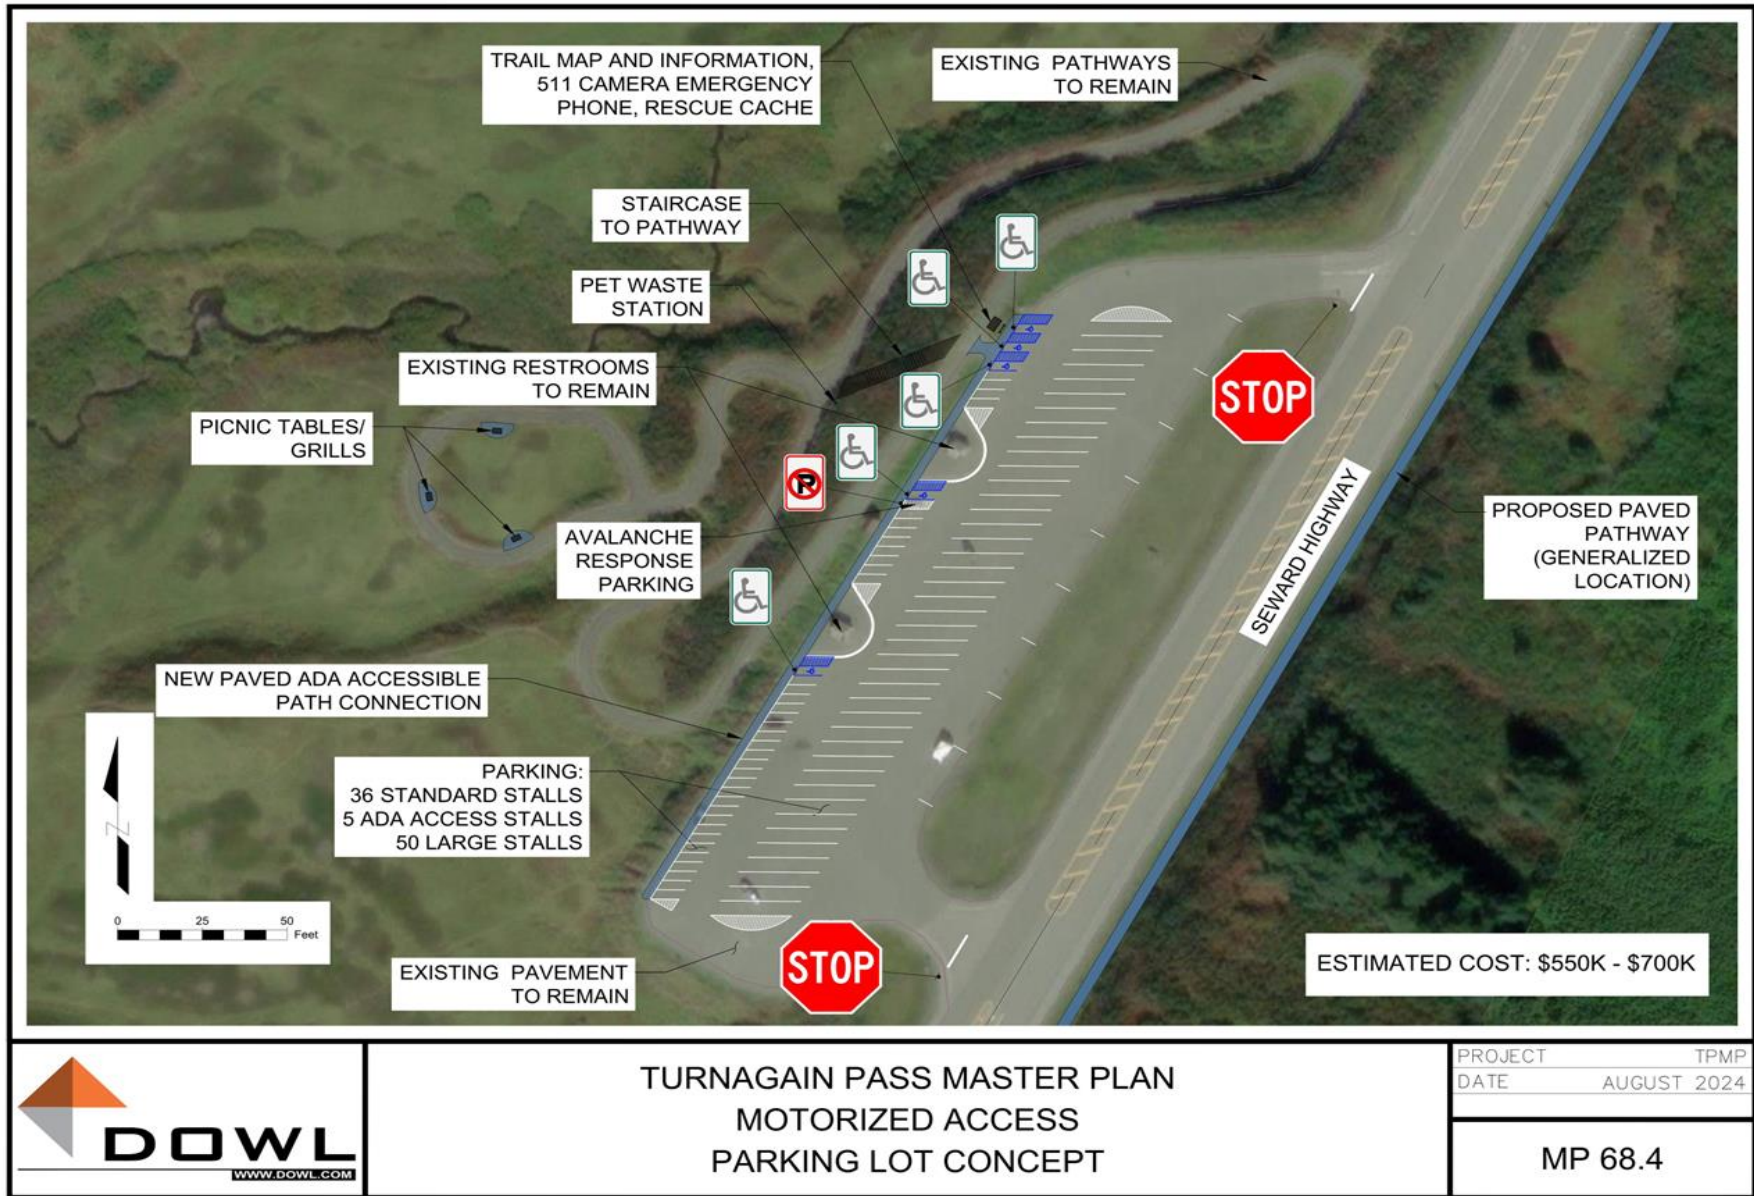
Motorized Access Parking Lot Improvements Conceptual Design
